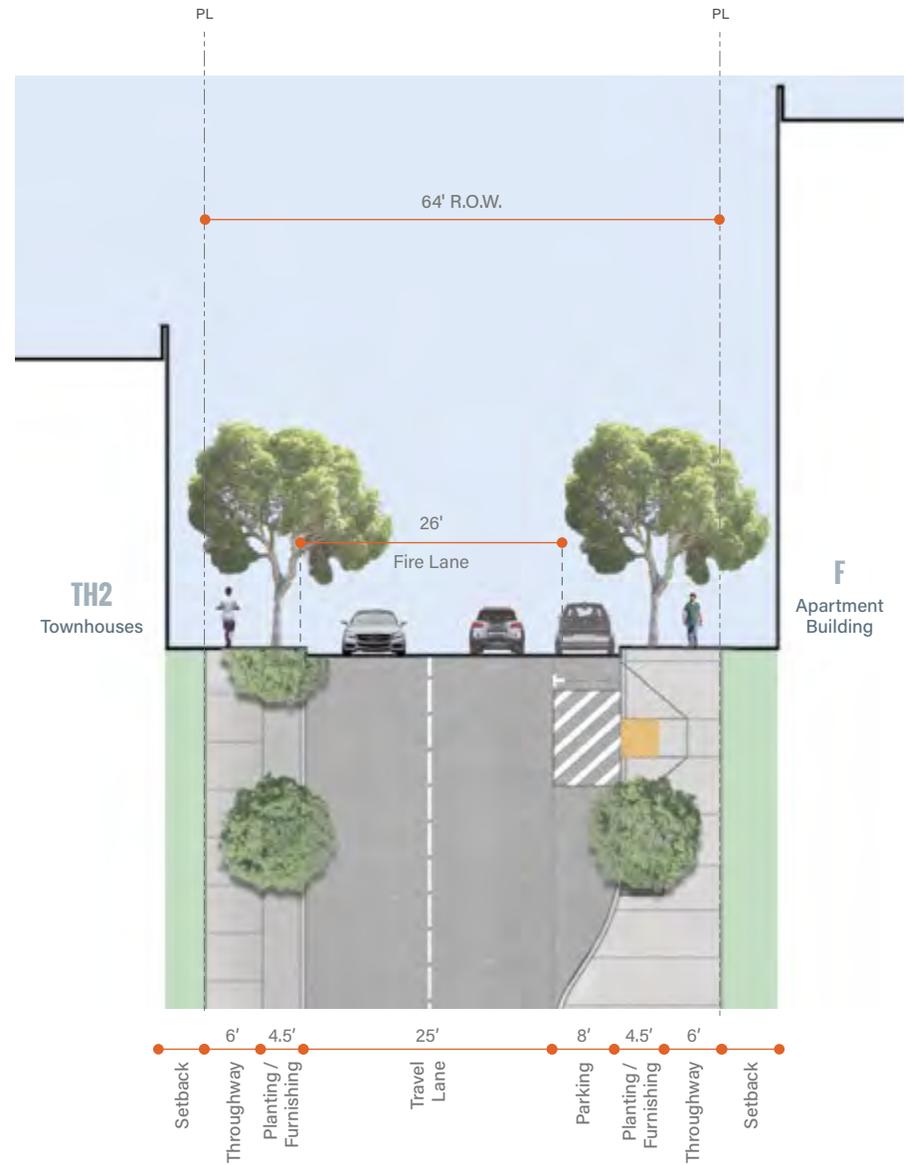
West Street, Section 1 *see "Figure 5.14-2: West Street, Plan Enlargements W.1 & W.2".
